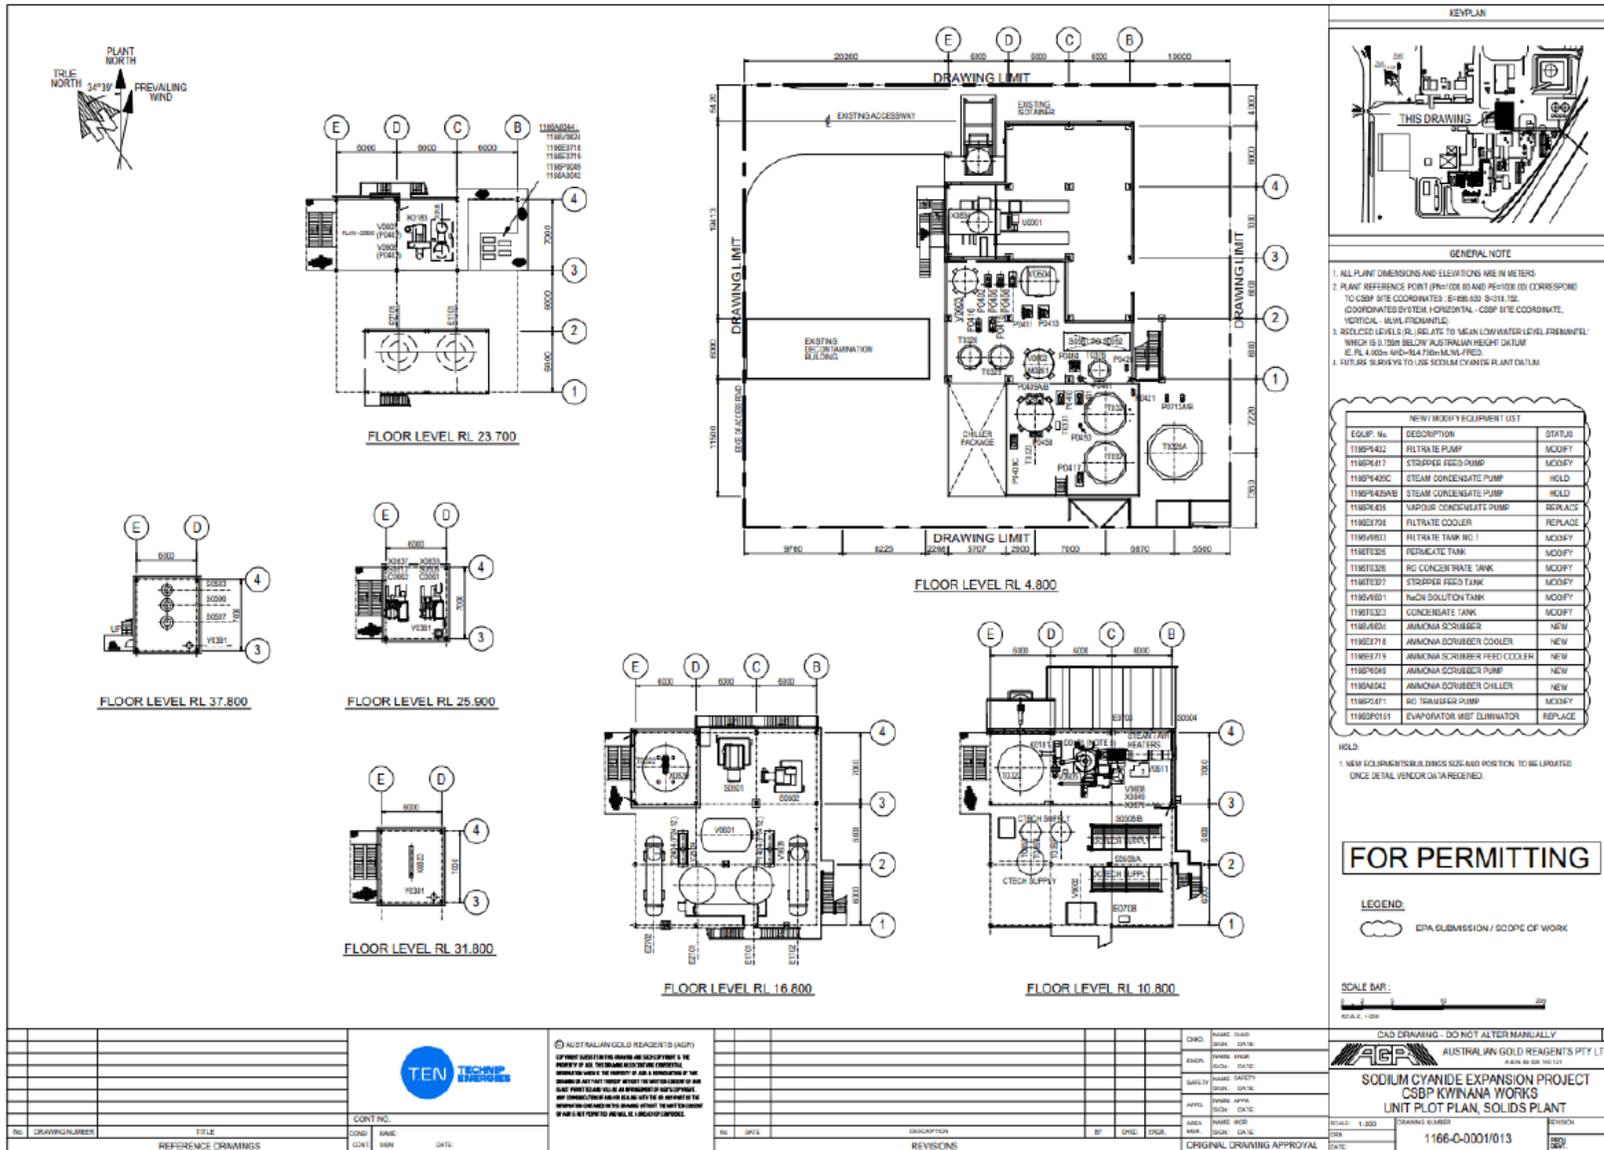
Expansion works layout plan for Sodium Cyanide Solids Plant
